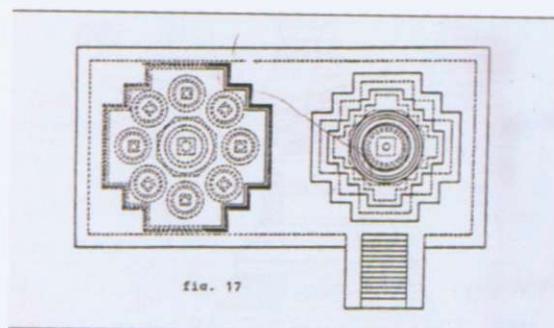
Plan and elevation of Candi Bungsu (Source: Schnitger 1937)
